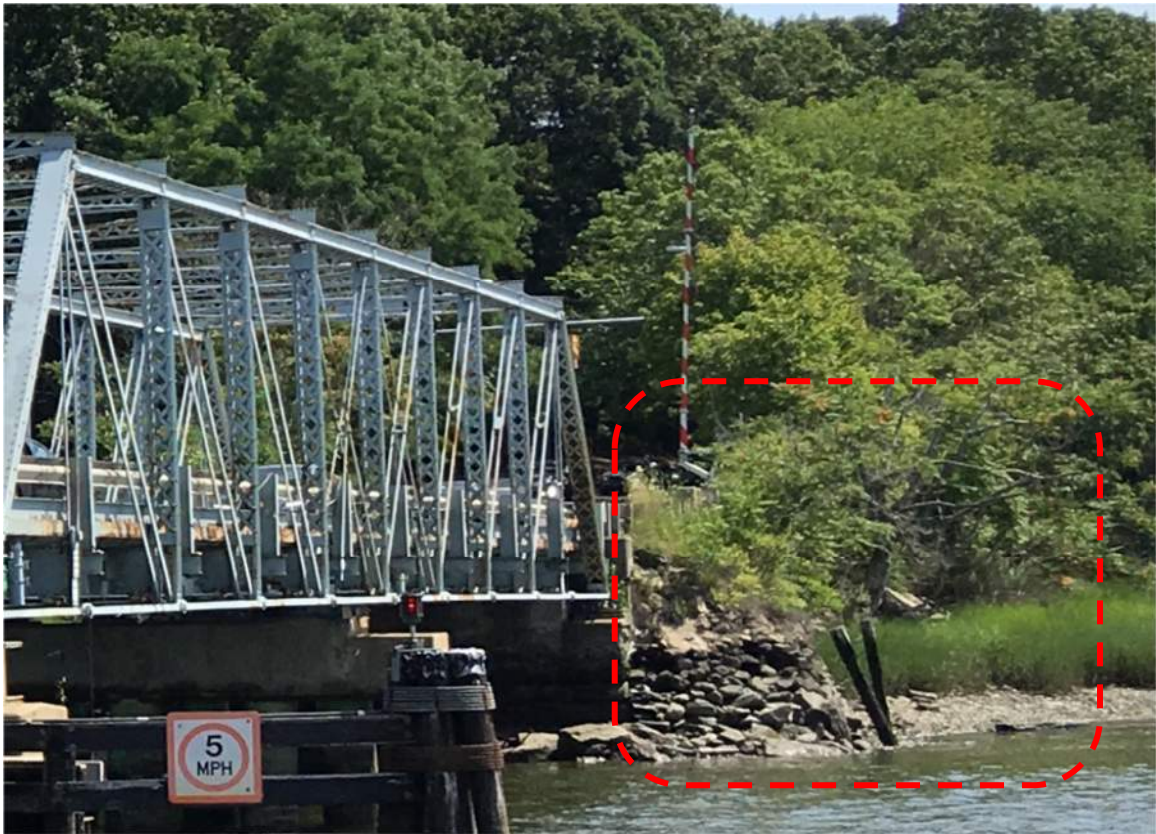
Block 53 / Lot 000. This developed parcel (outlined in red) abuts the southeast corner of Bridge #01349.
